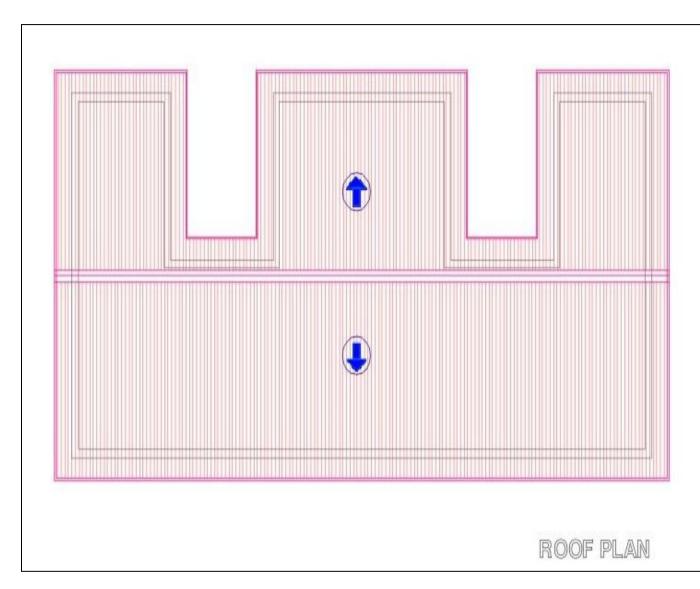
Typical Roof Plan of Low-Cost Houses Source: Field Survey (2014)
